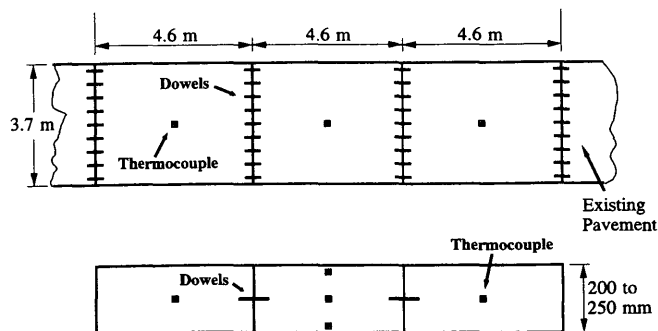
Typical field installation: top, plan view; bottom, cross section.
